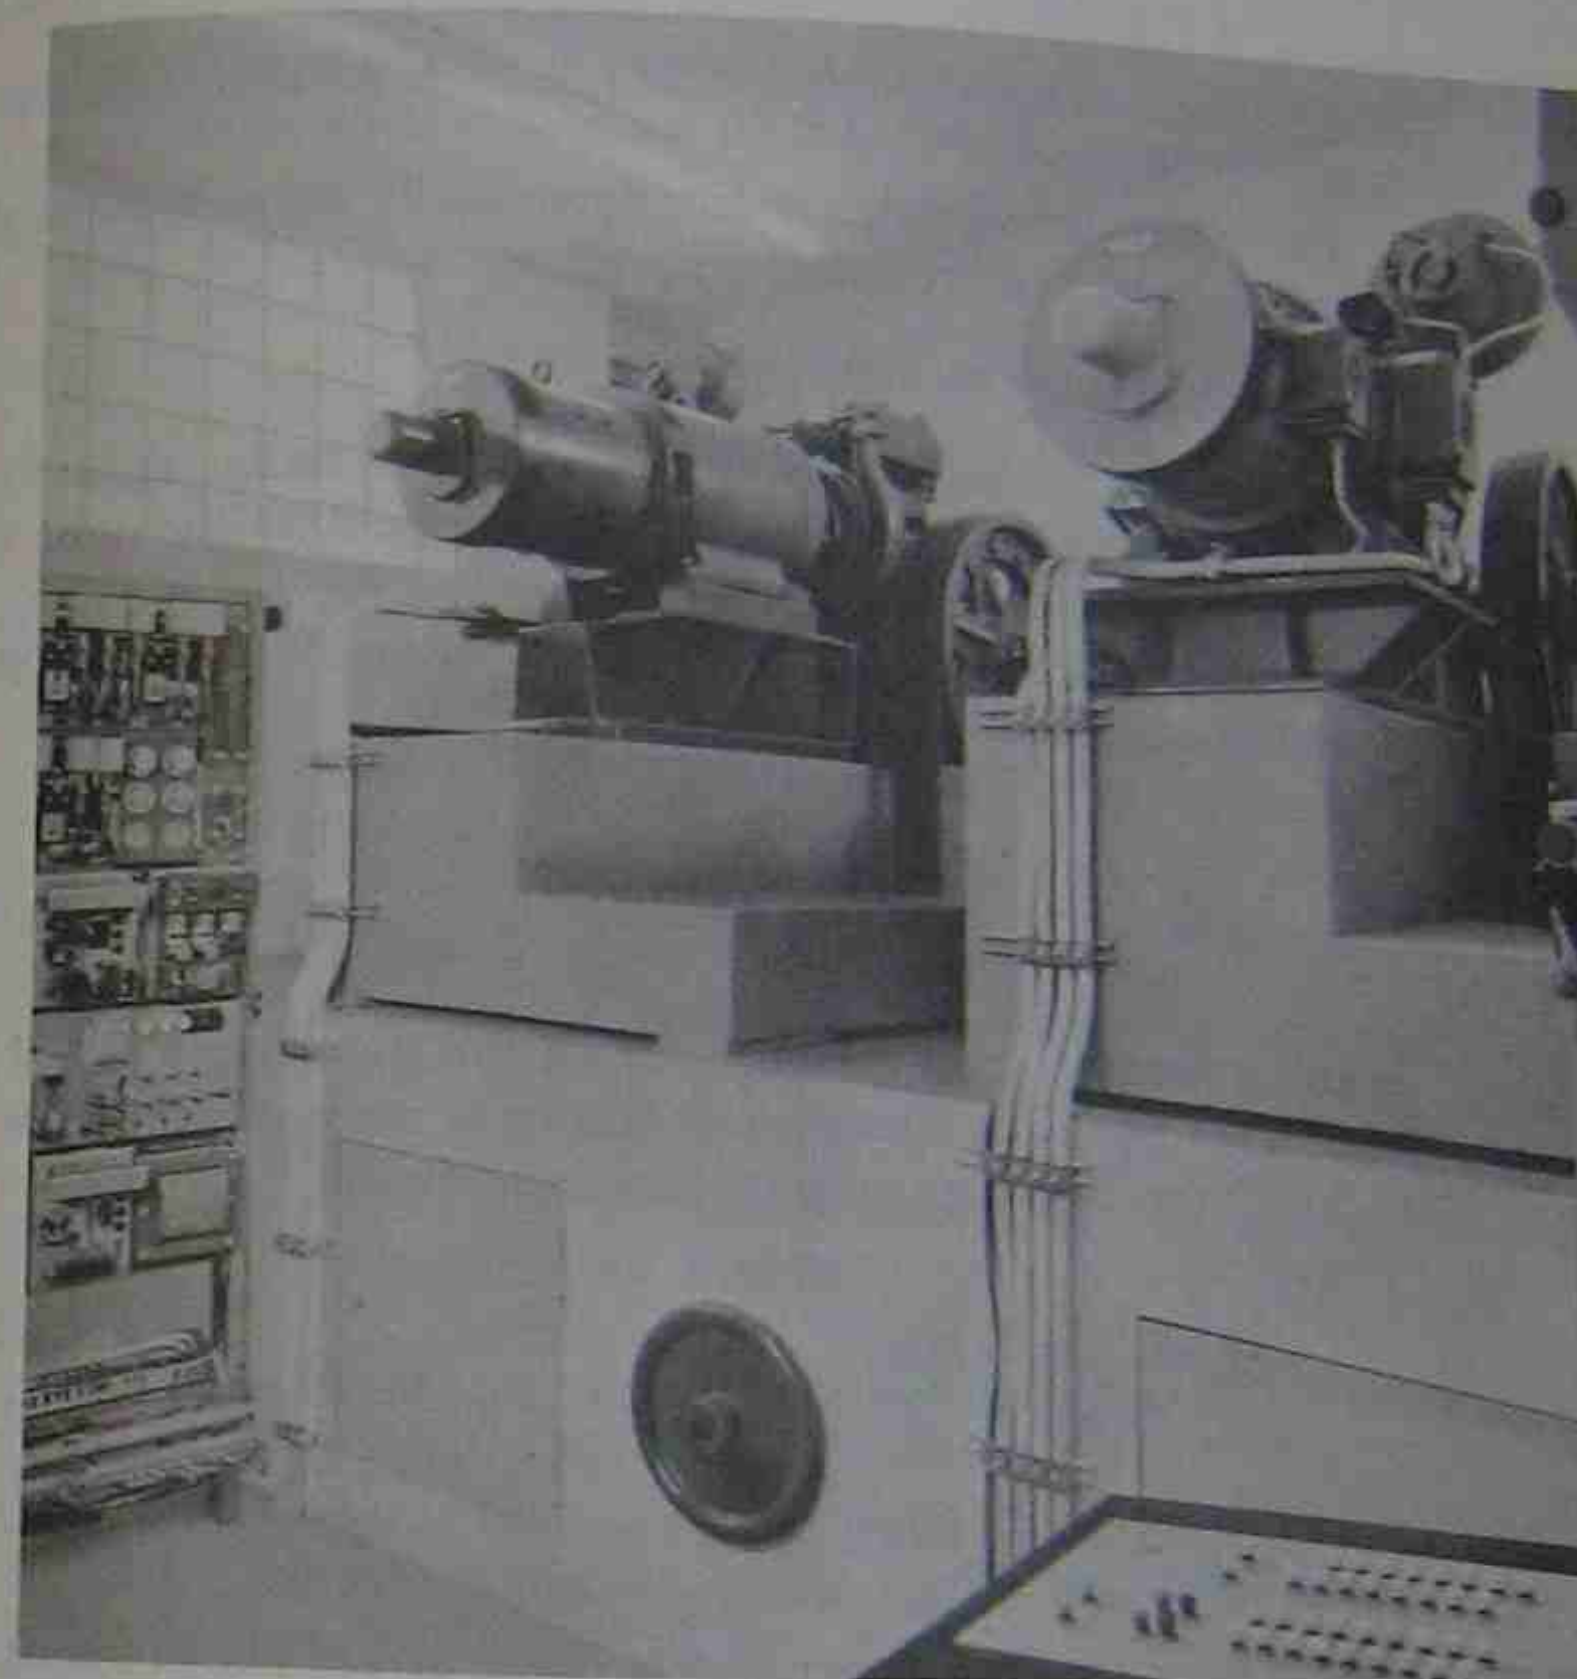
Elevator machines supported by a heavy concrete block.
